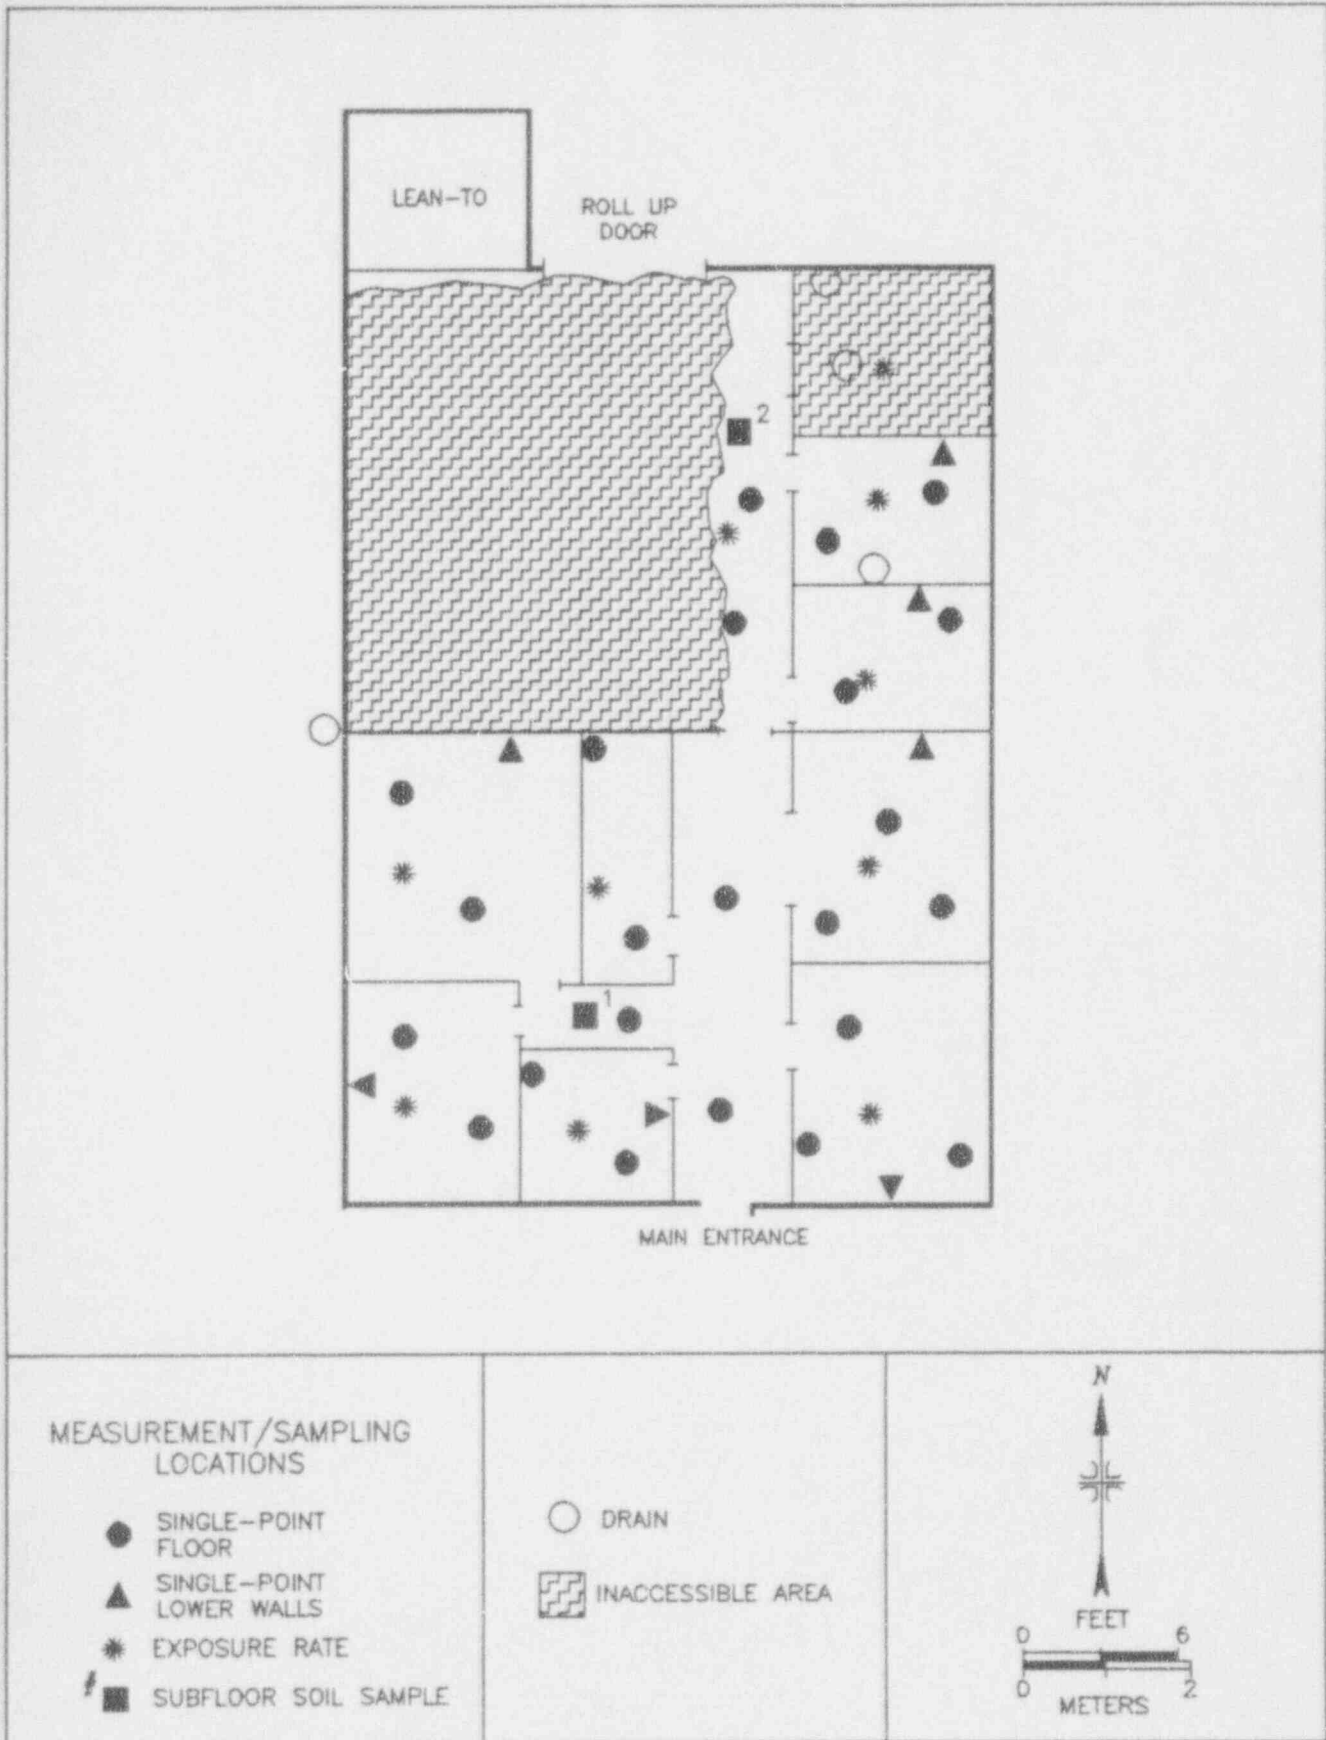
Engineering Building - Measurement and Sampling Locations
